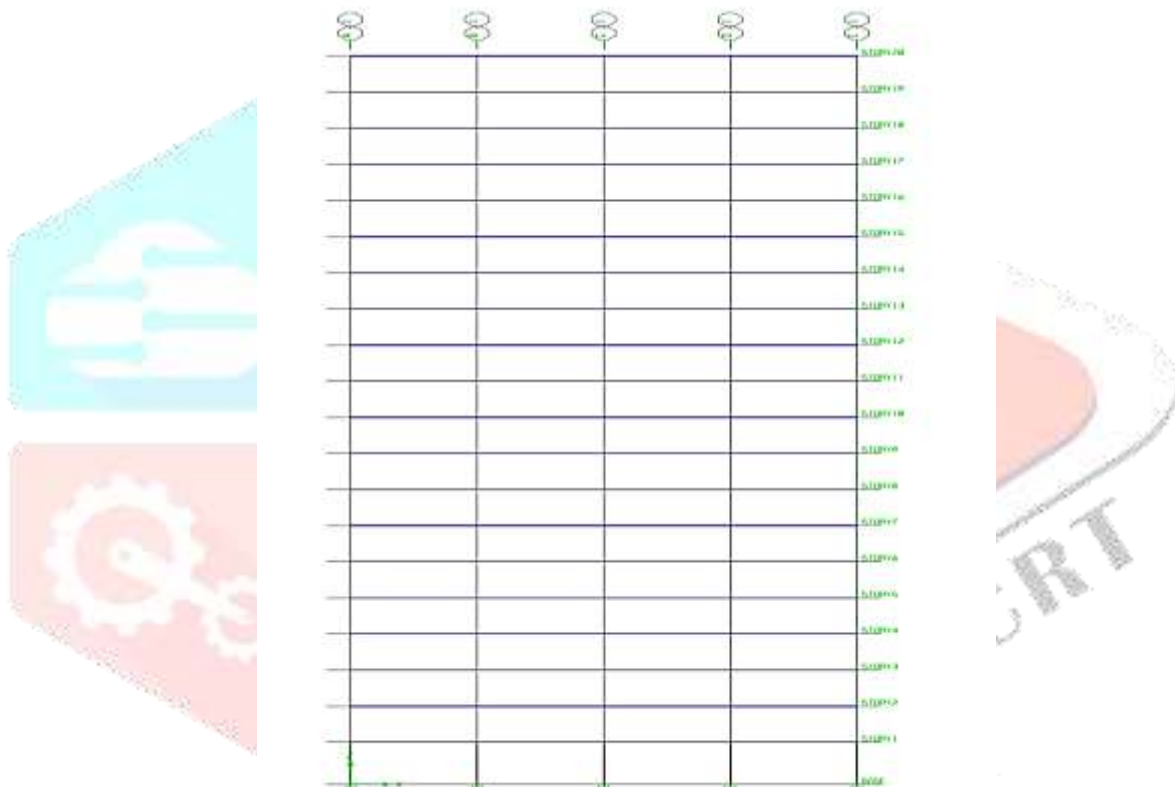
Elevation of 20 - Storey building without strut
